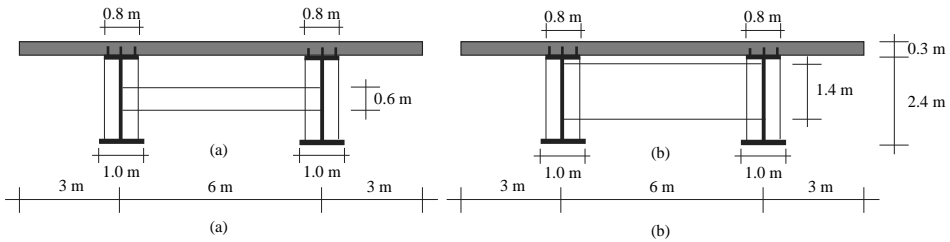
Twin-girder cross section geometry: (a) mid-span cross-section and (b) support cross-section.
